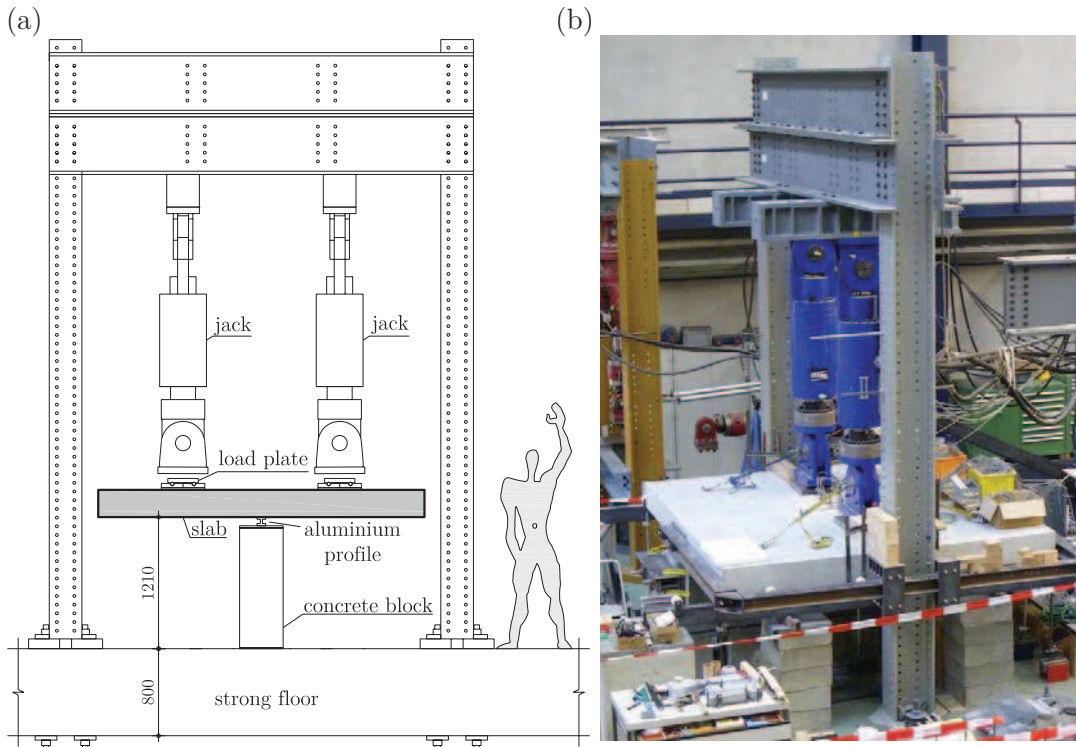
Test setup (dimensions in [mm]): (a) side view; and (b) picture
